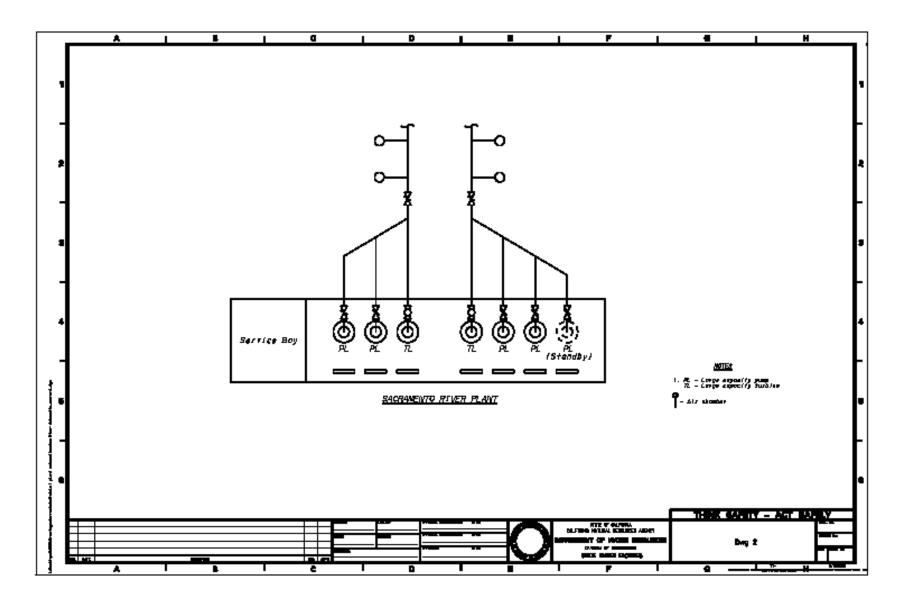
Sacramento River Pumping/Generating Plant Motor Floor Plan
